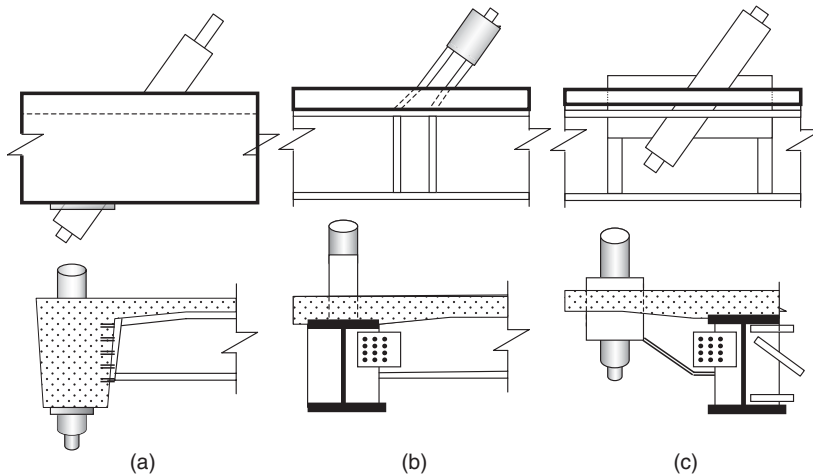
Stay-deck connections: (a) Tagus Bridge; (b) Boyne Bridge; (c) Second Severn Bridge
